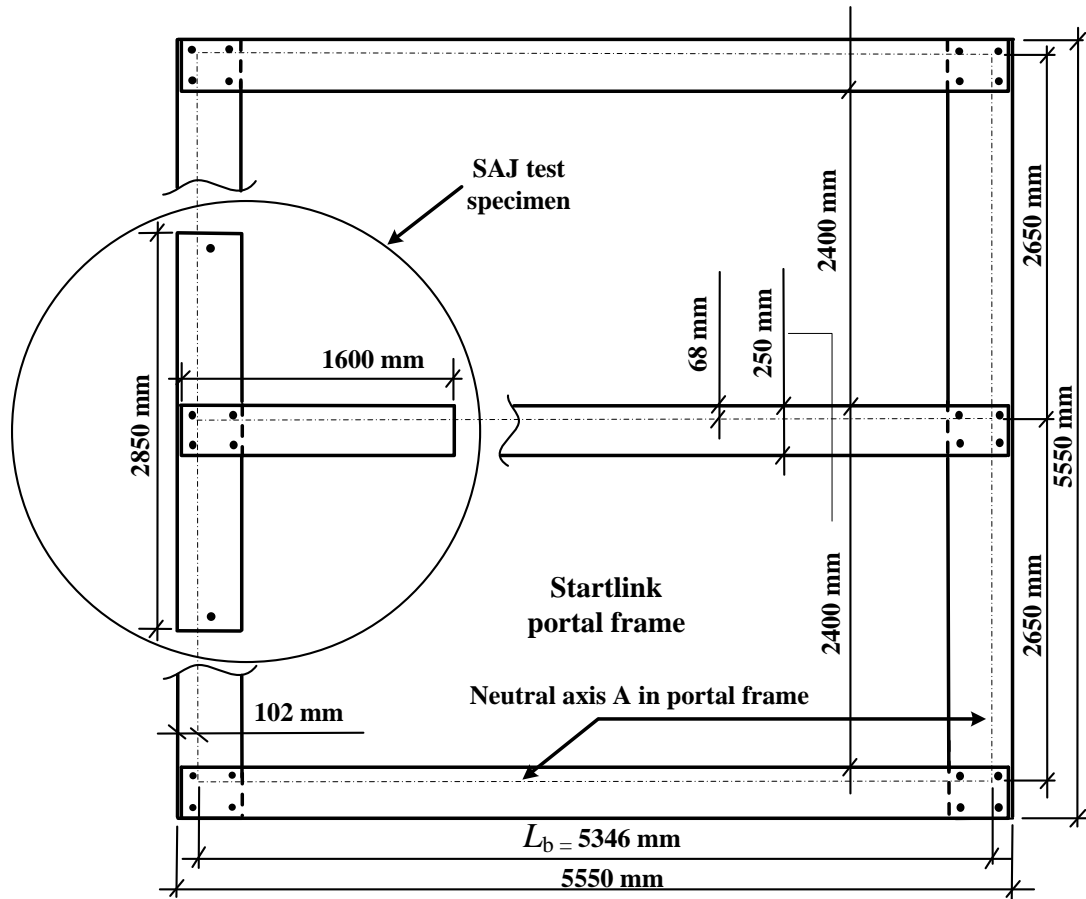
Startlink portal frame with specimen of external frame joint (SAJ) at the first floor level.
